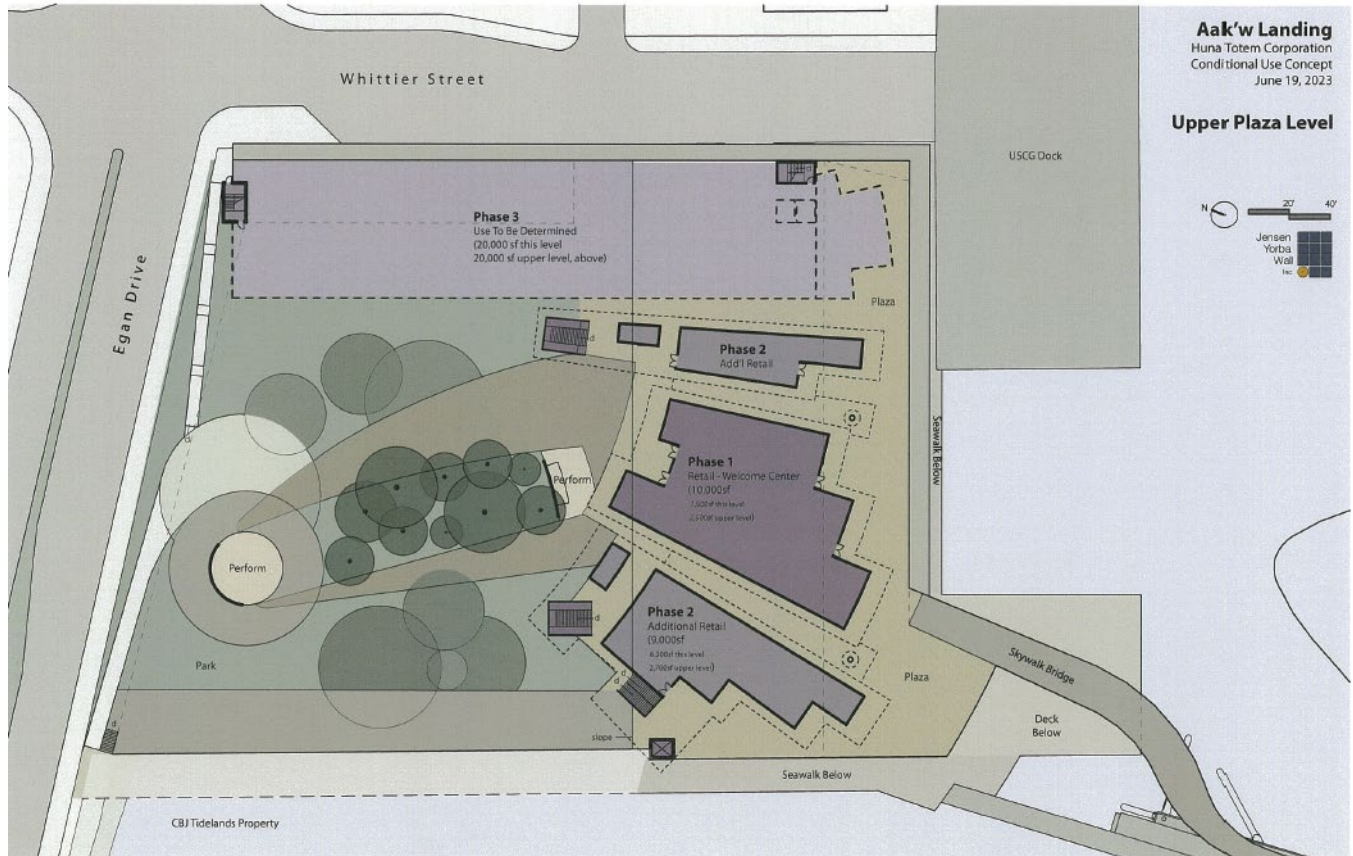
Site plan showing Phase 1, 2 and 3 structures. The park, underground vehicle parking facilities and dock are part of Phase 1.
